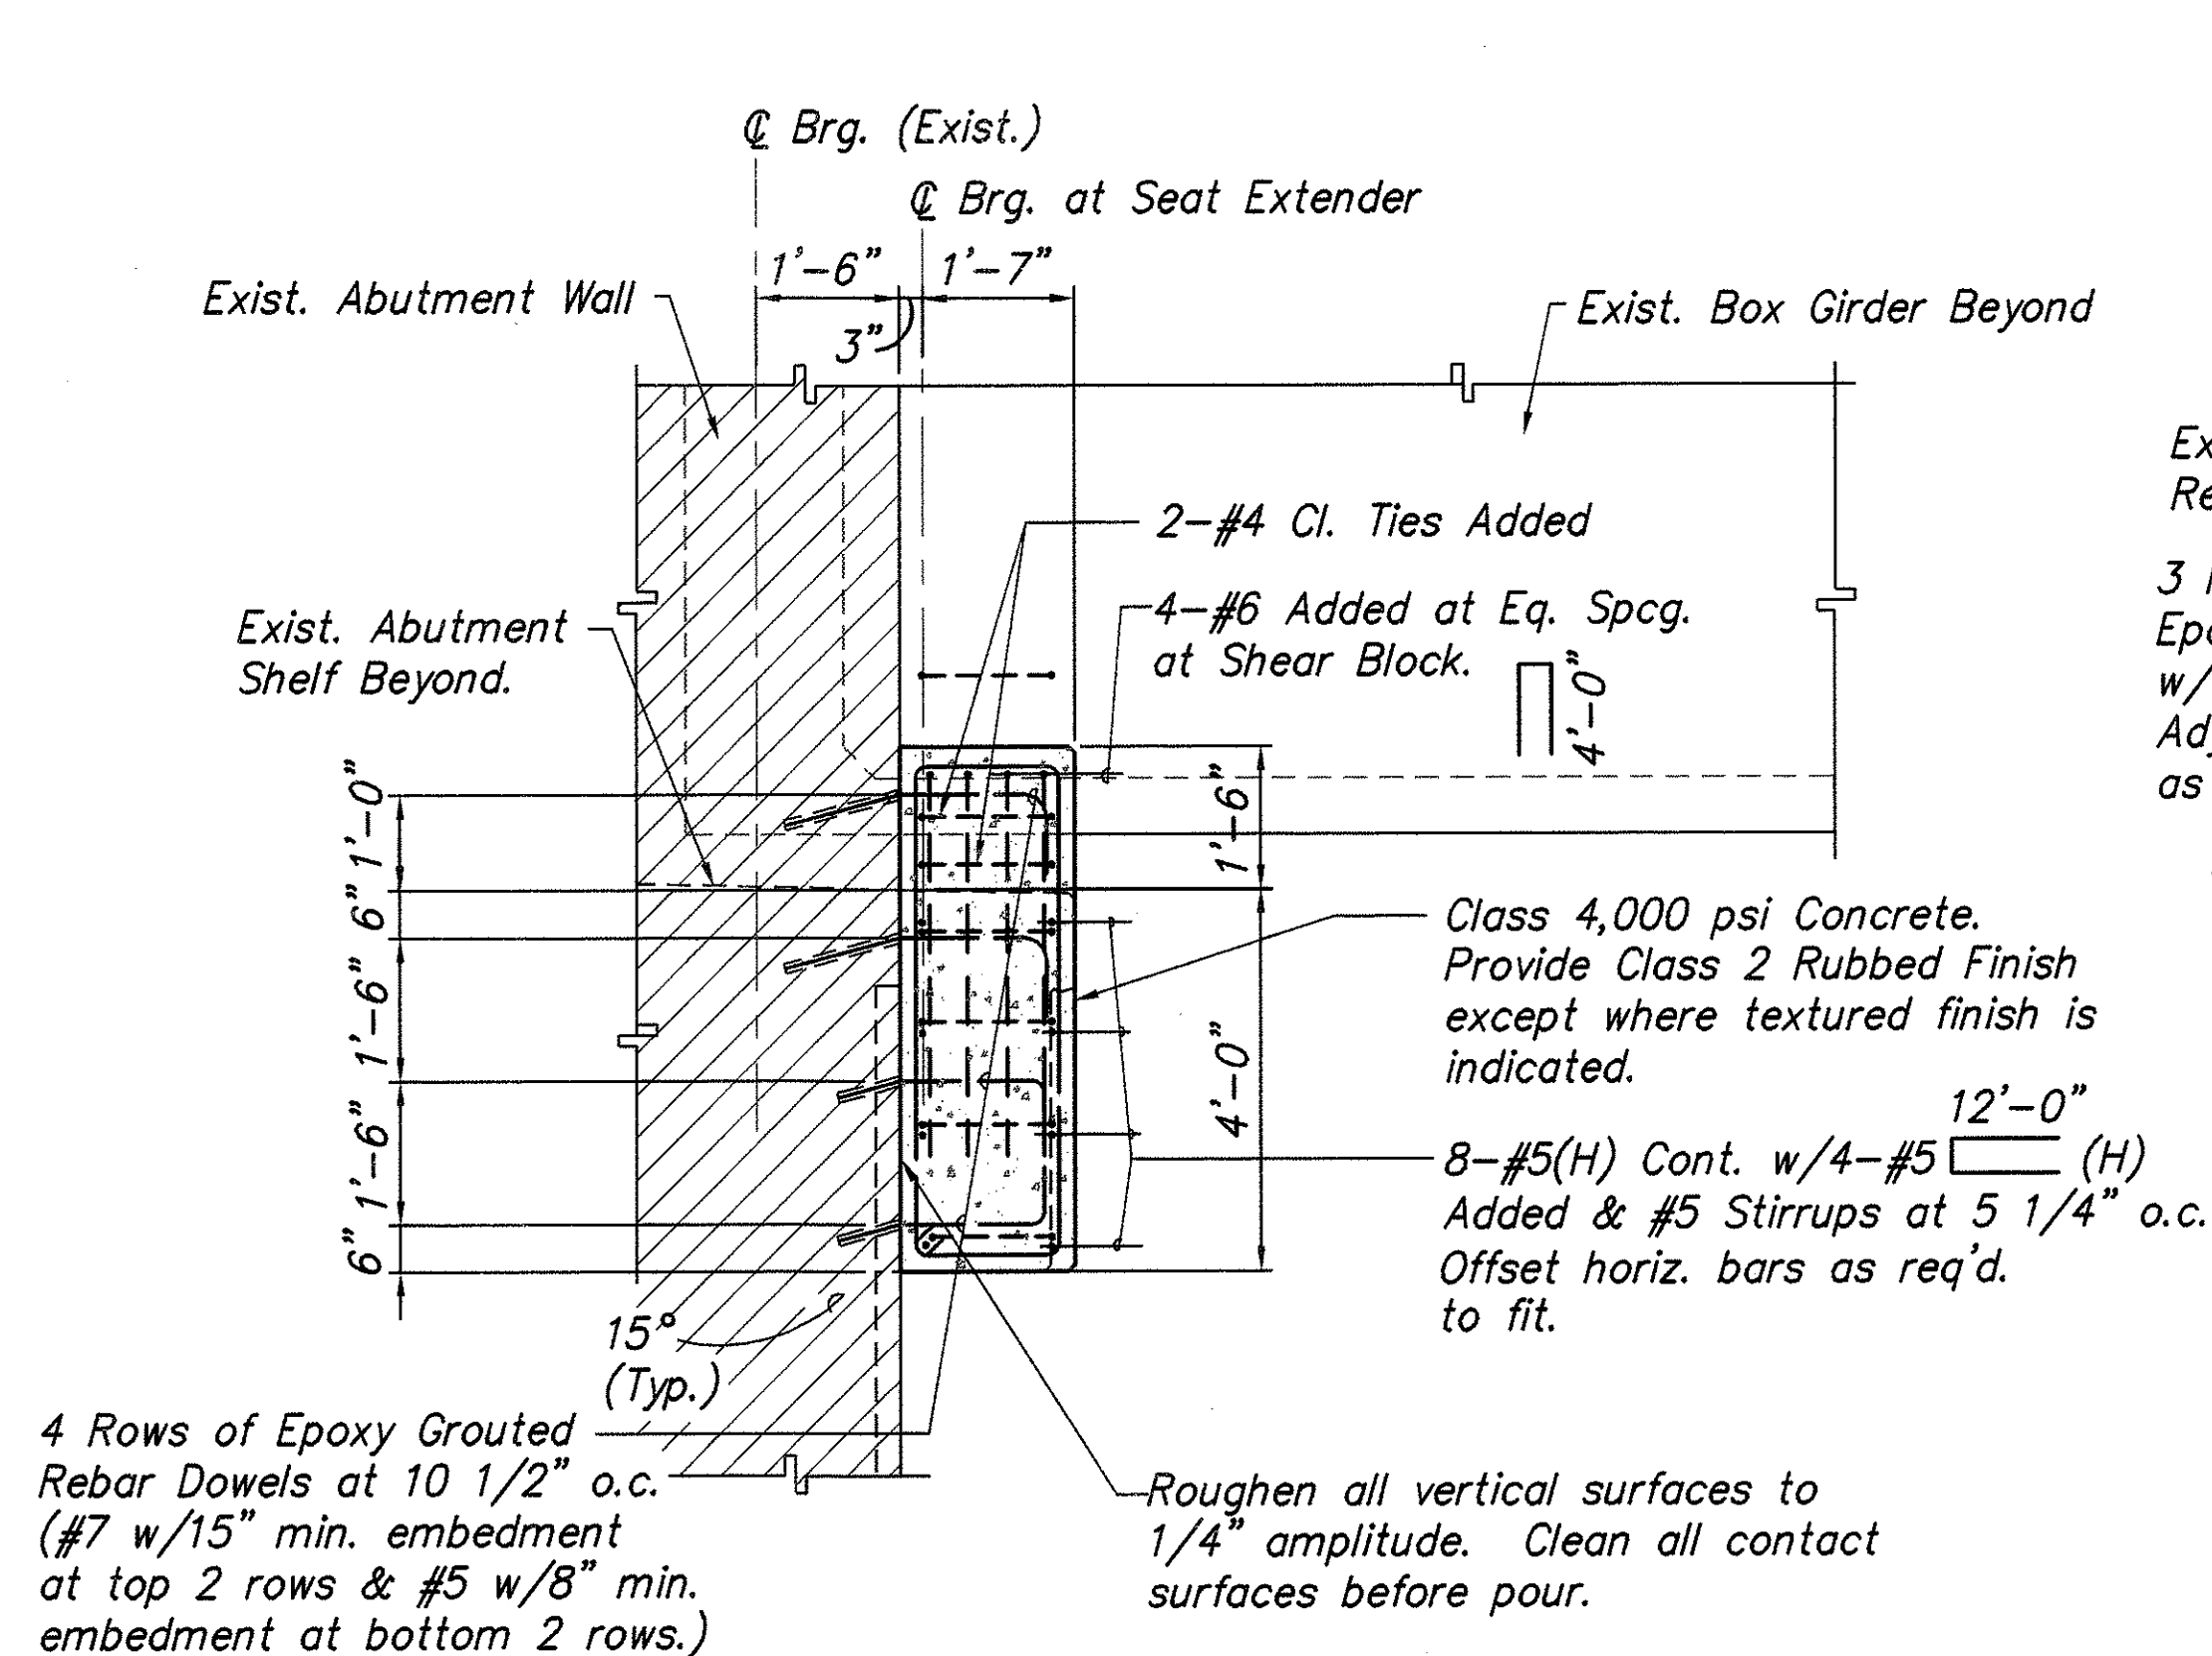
DETAIL-PLAN AT TYP. GIRDER BEARING 1
